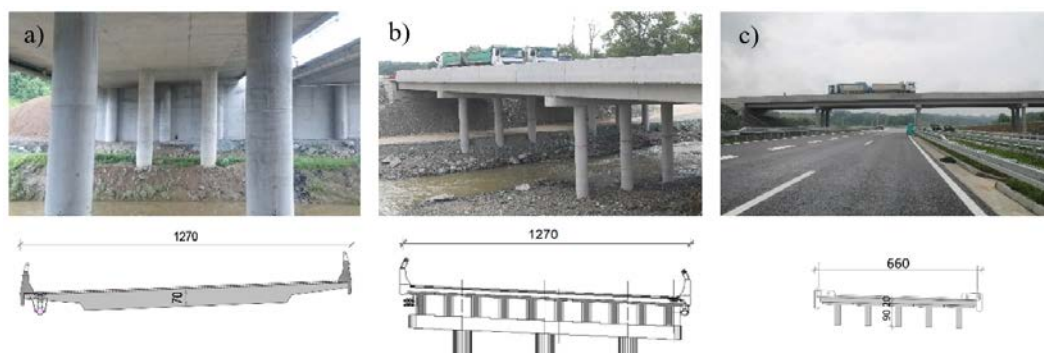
Typical bridges and corresponding cross-sections: a) bridges on the main road - type 2, b) side roads bridges - type 3, c) side roads bridges - type 4.
